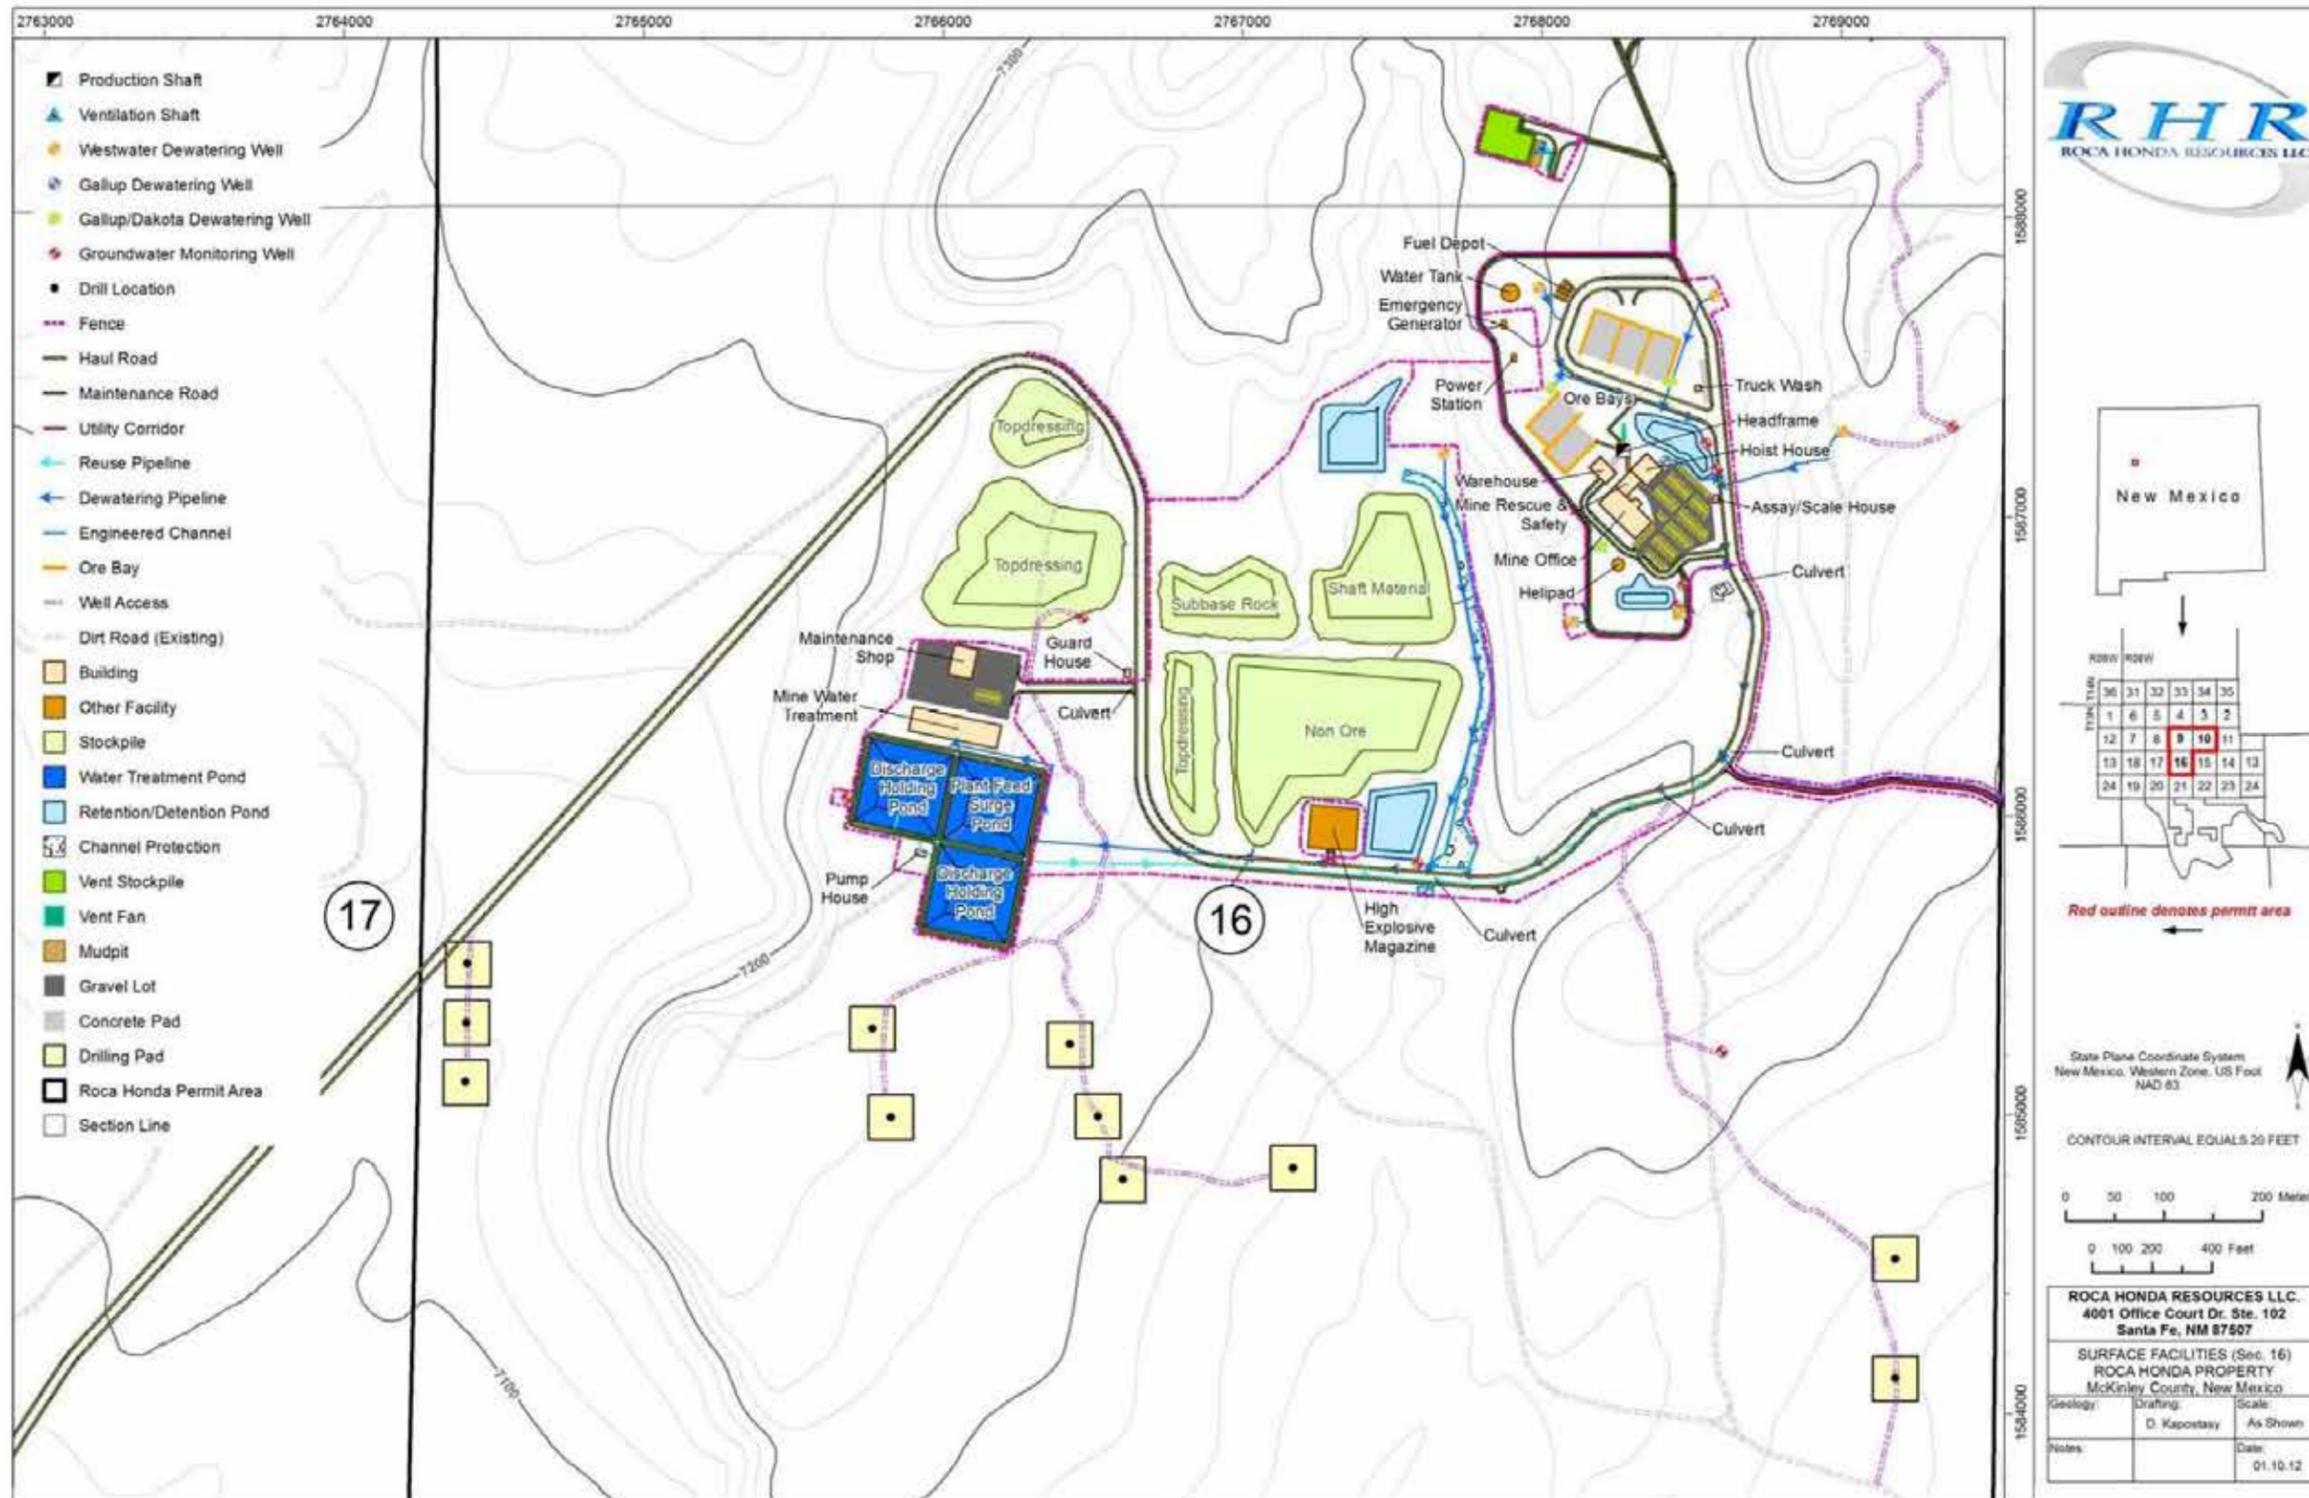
Layout of surface facilities in Section 16 for the proposed Roca Honda Mine
